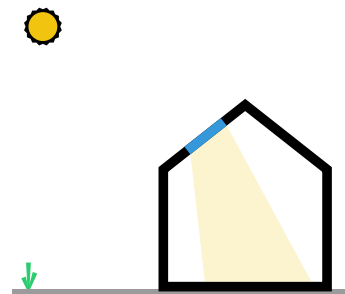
Skylight; window placed in the roof of a building. Since a skylight is facing towards the zenith it admits more light per unit area than vertically placed windows.
